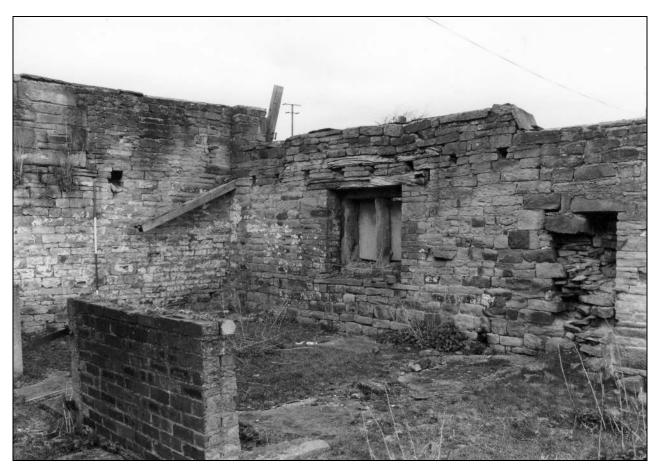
Interior of building 2a, from the south-west (film 2, frame 12)
